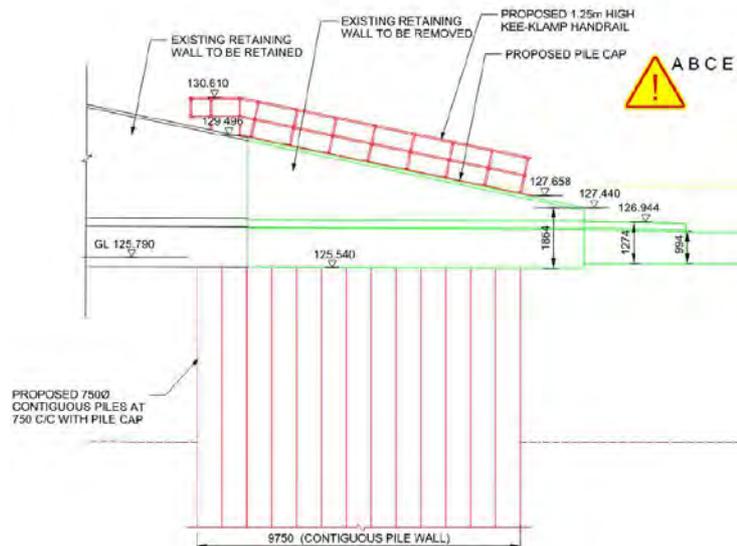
Image of proposed retaining wall taken from (152270-25067-MLN1-DRG-ECV-400042 P01)
